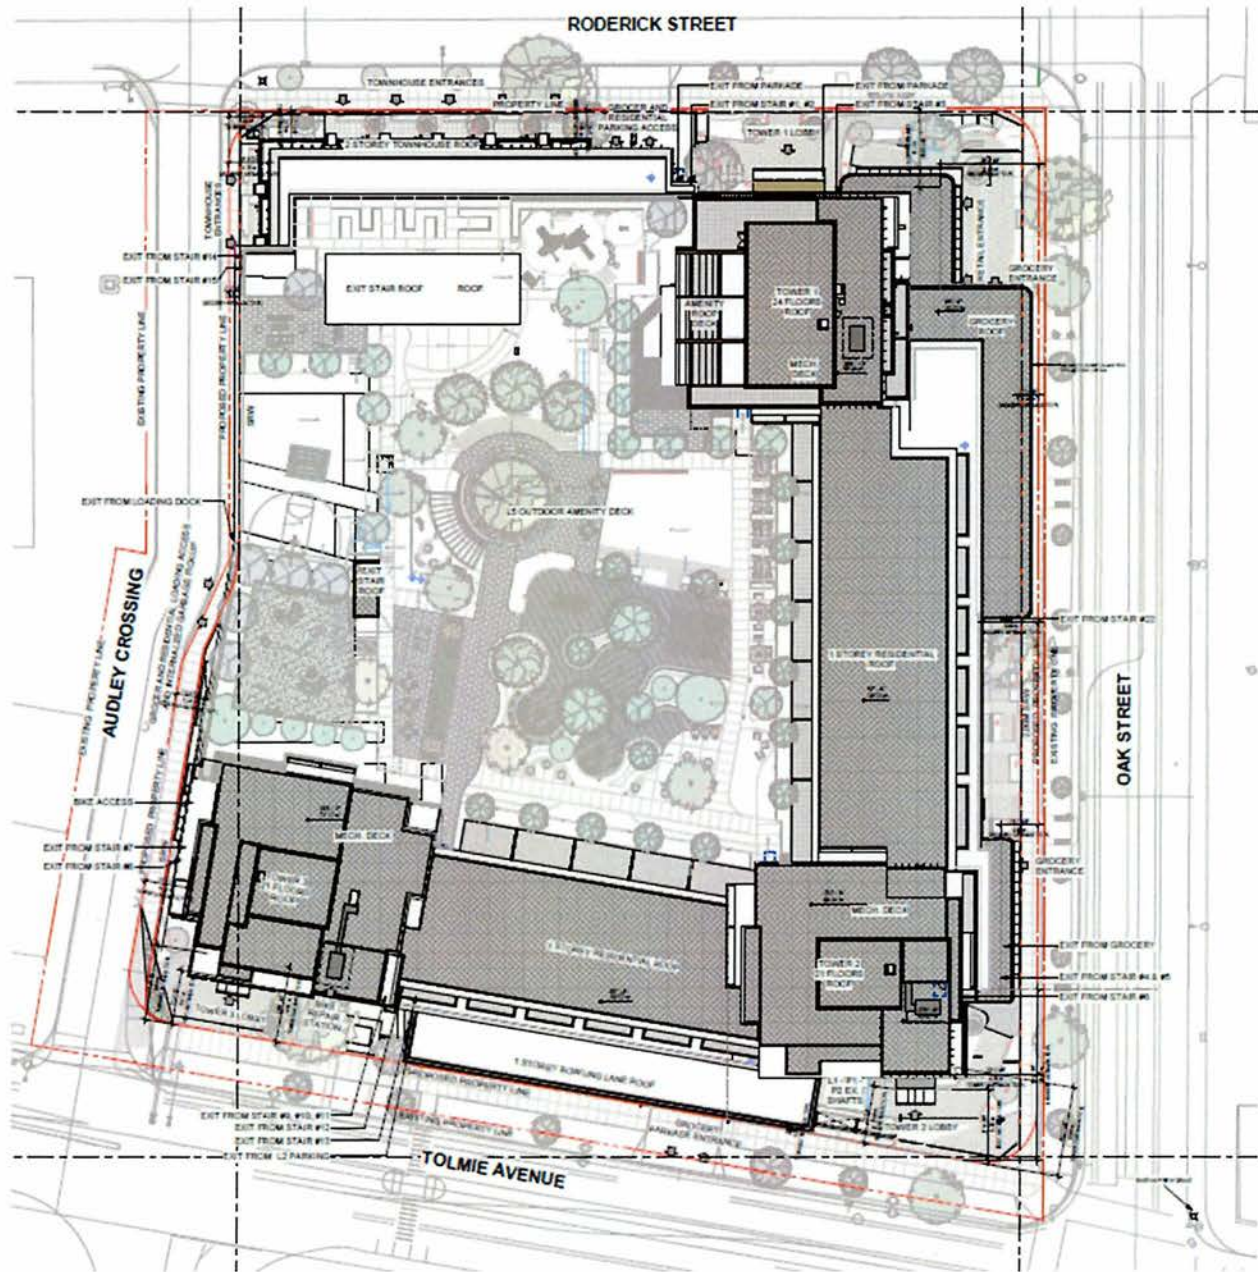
Site Plan, provided by Chris Dikeakos Architects Inc.
